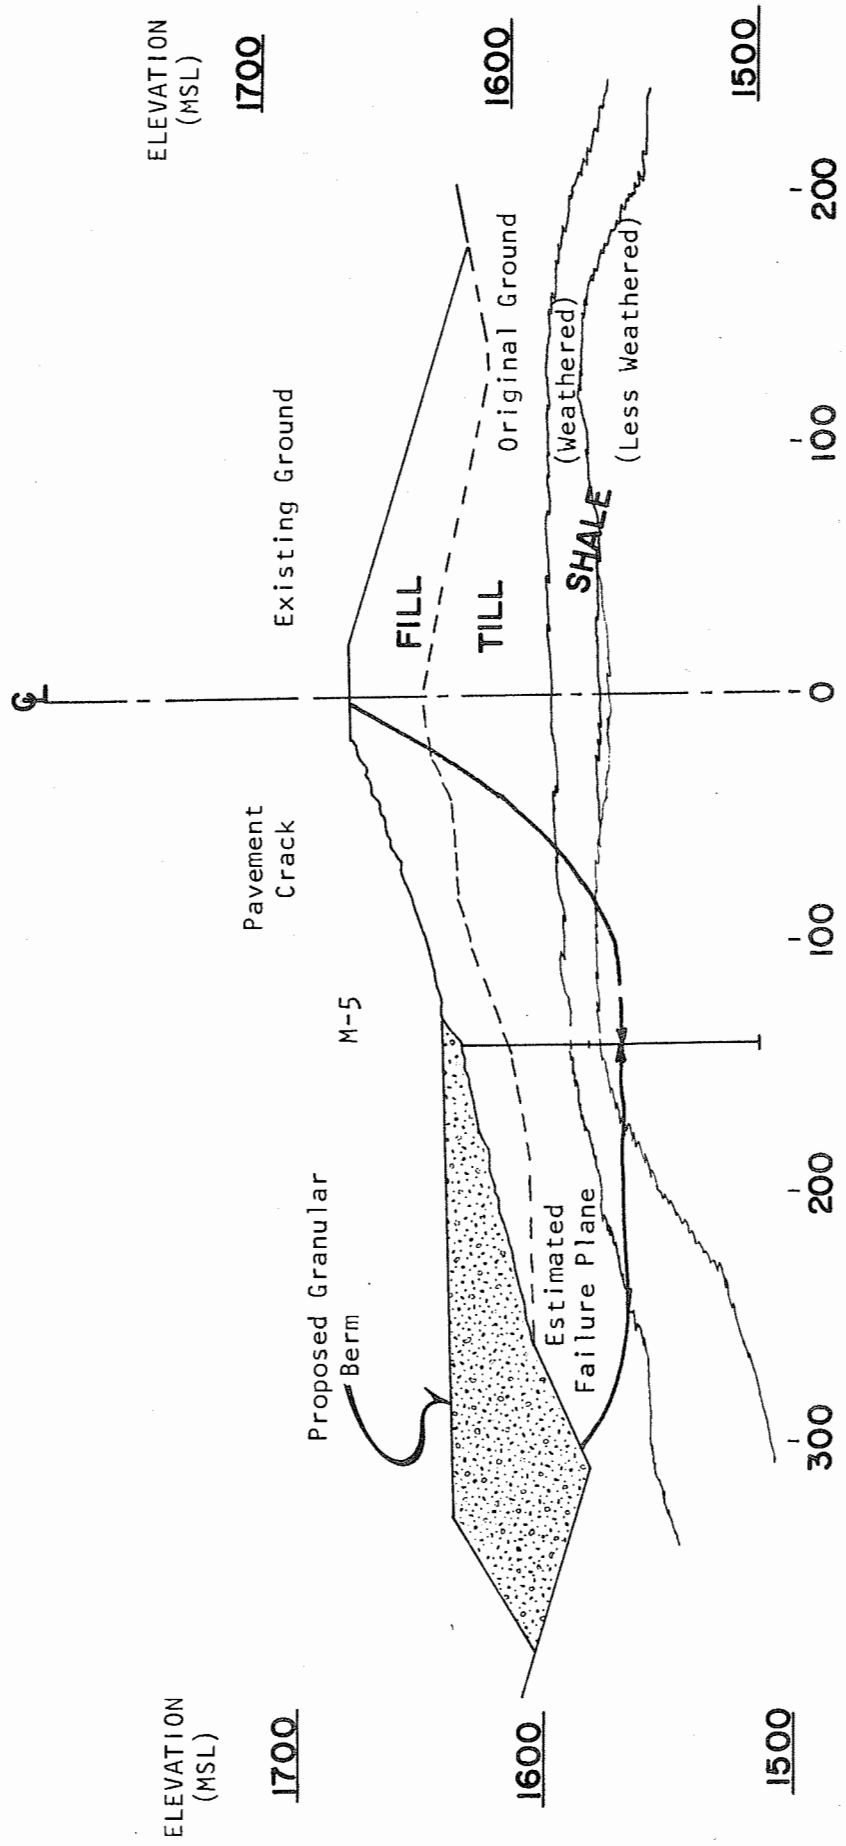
Section Through Approach Fill Showing Proposed Berm.
